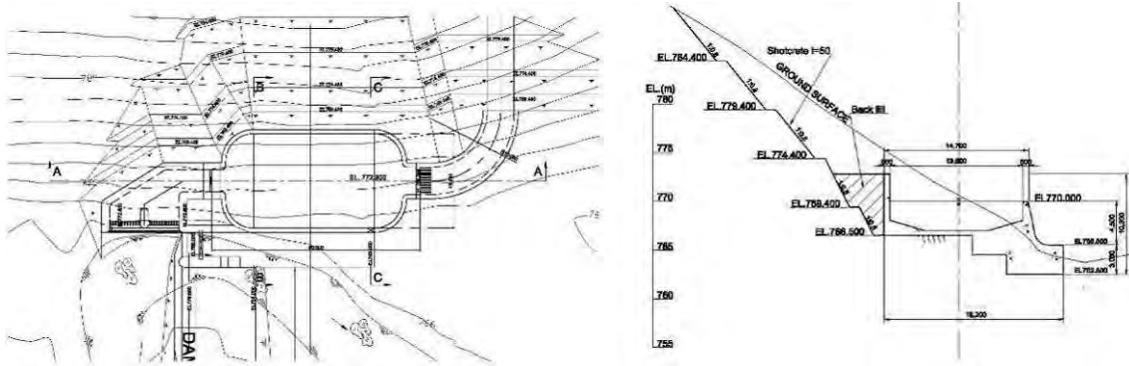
Layout Plan and Cross Section of the Settling Basin
